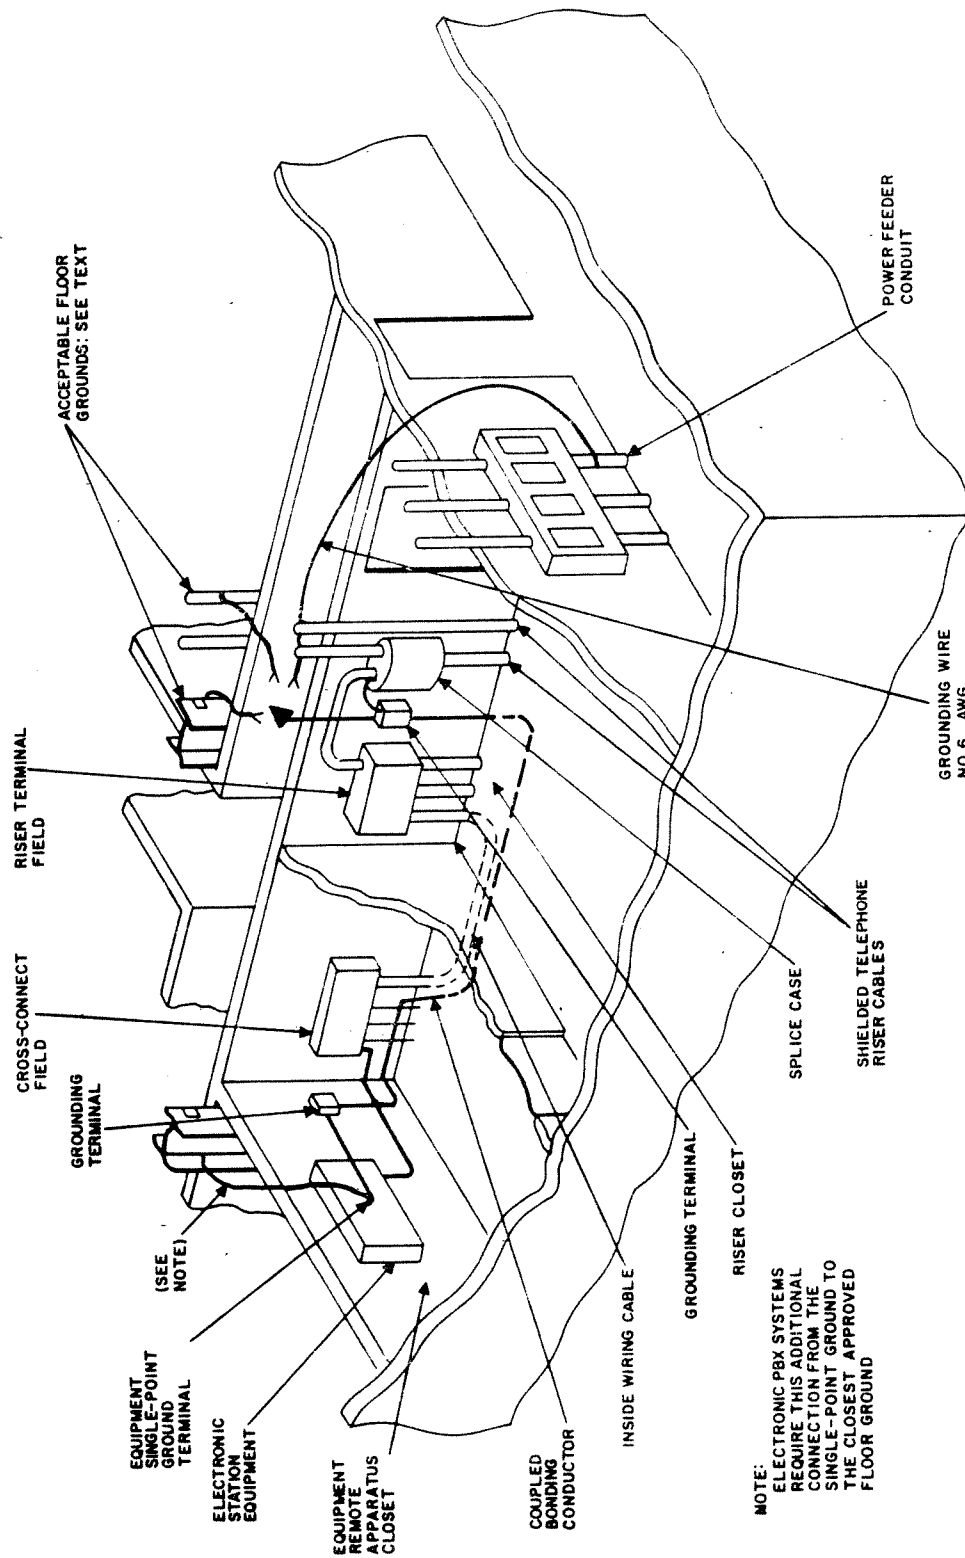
Equipment Bonding—Typical High-Rise Building Floor
